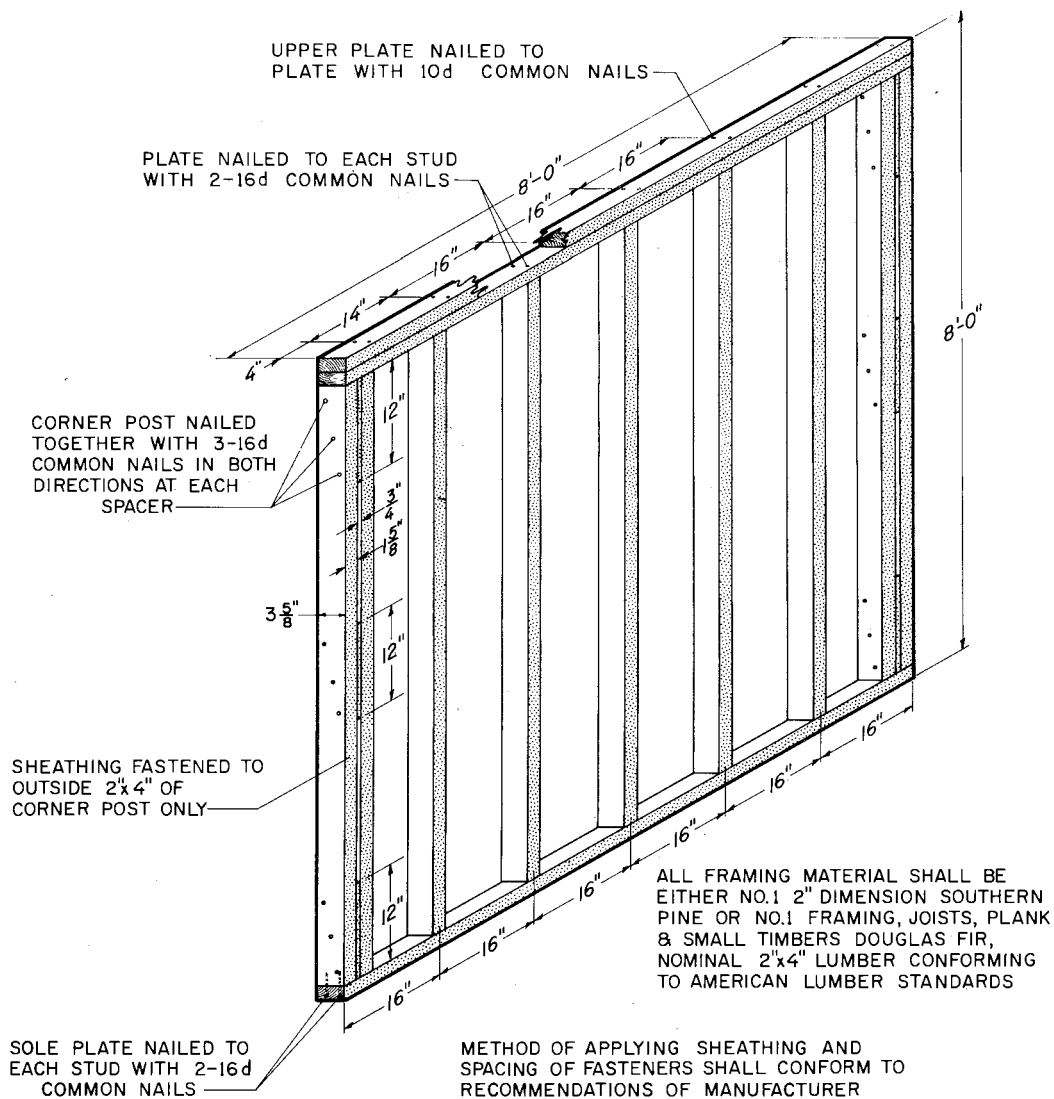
Wood frame wall panel used for racking tests. (M 128 759)
